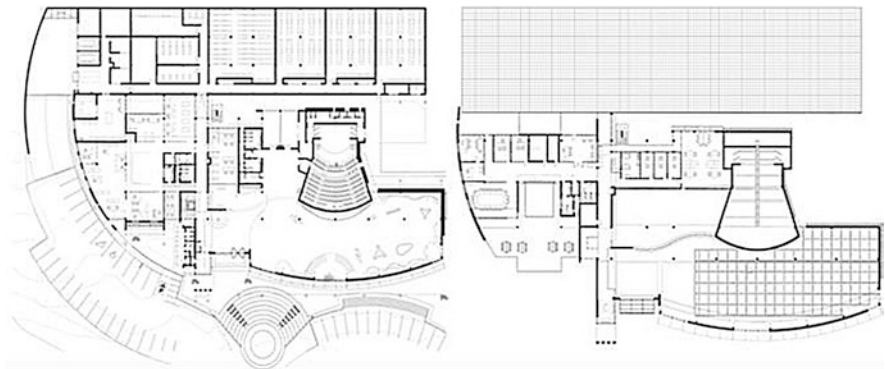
Ground (left) and first-floor plans. (Source: NELM, 2017)
